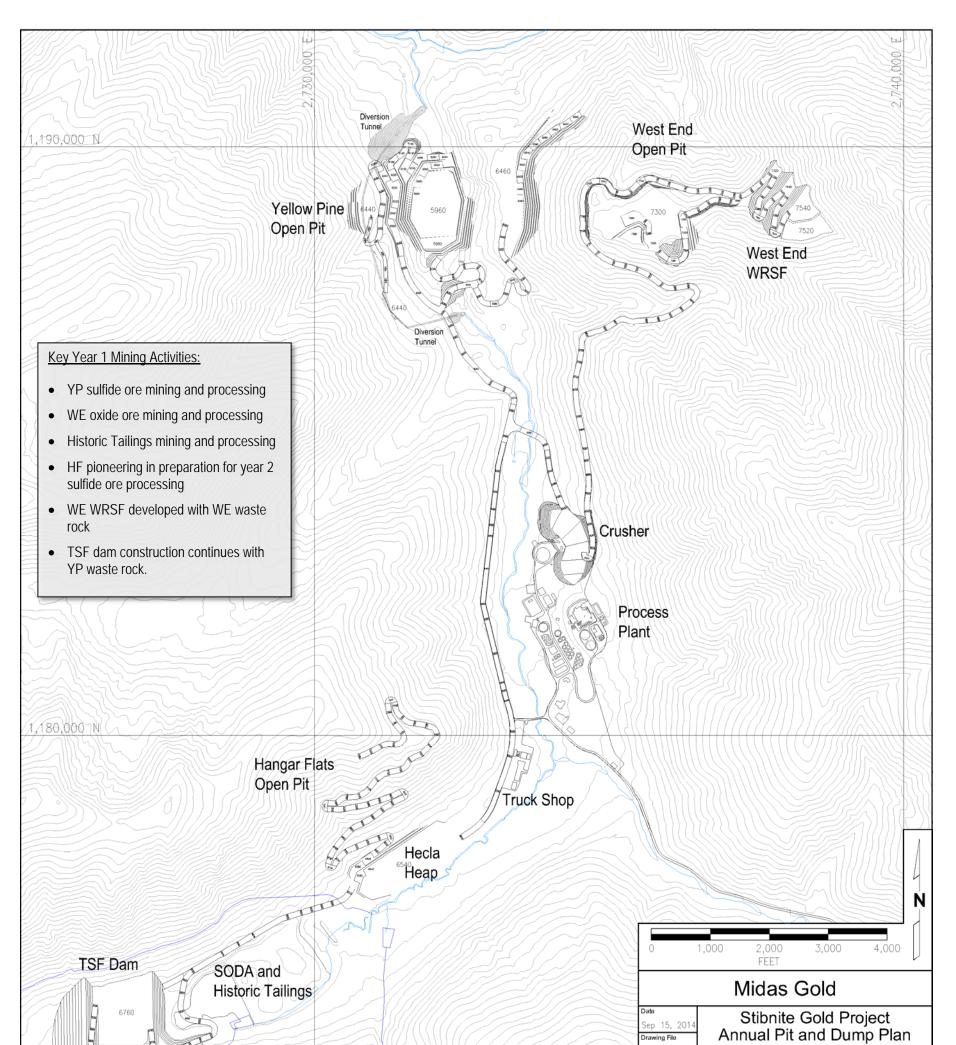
Annual Open Pit and Waste Rock Storage Facility Plan – End of Pre-Production
